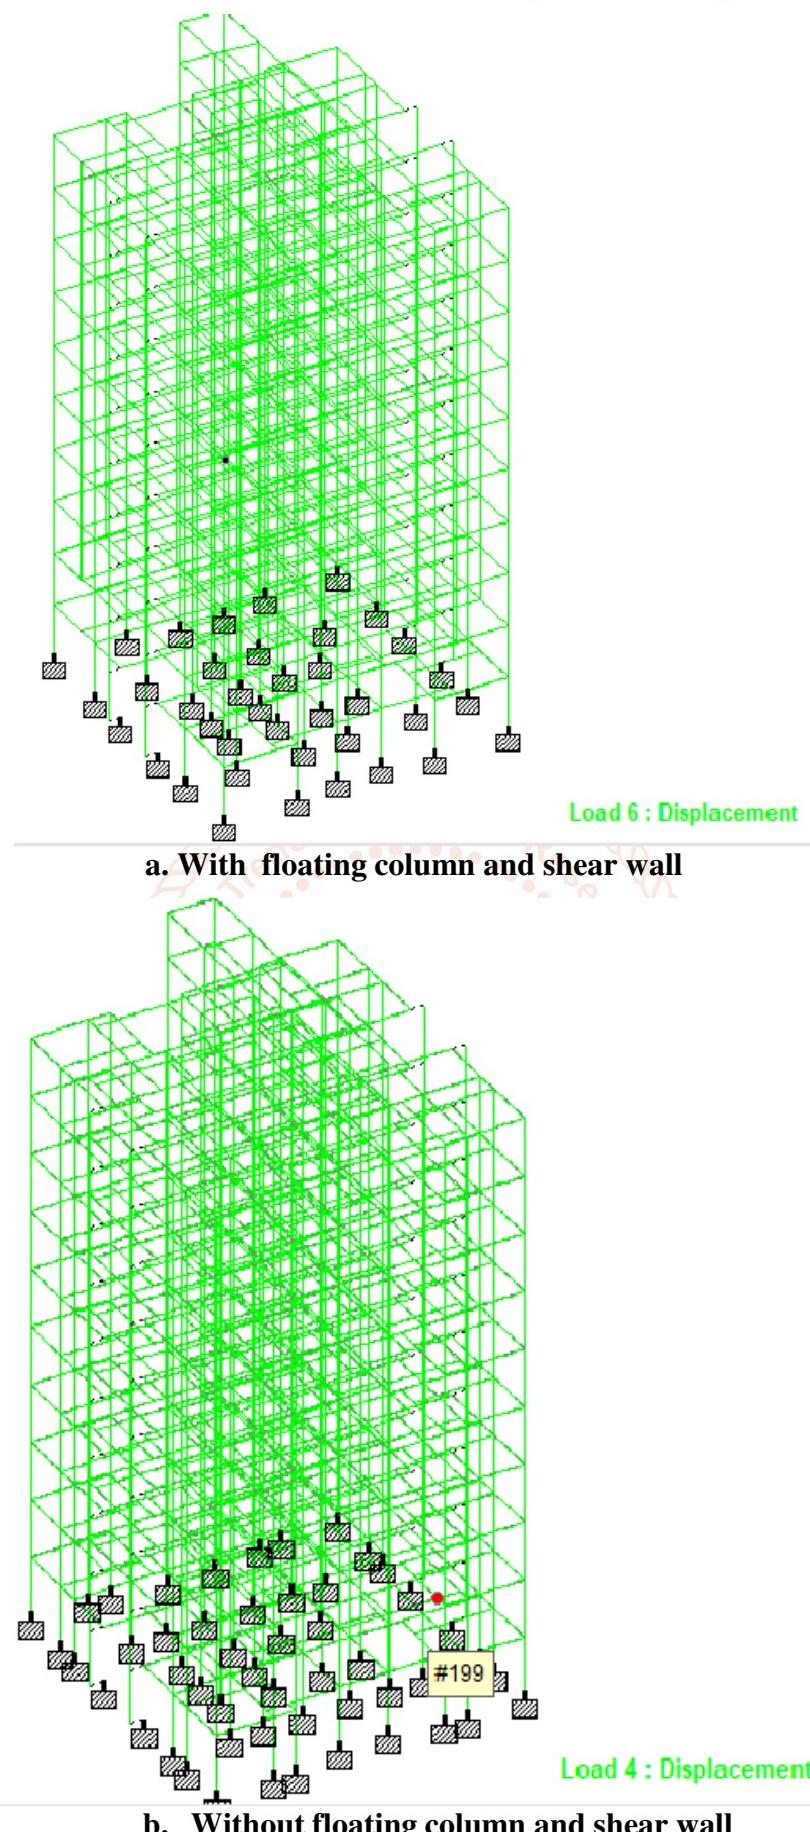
STAAD. Pro Model showing Nodal displacement in Building with and without floating column and shear wall
